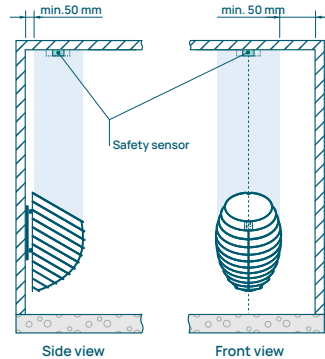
Installing the safety sensor on the ceiling: wall-mounted heater.
